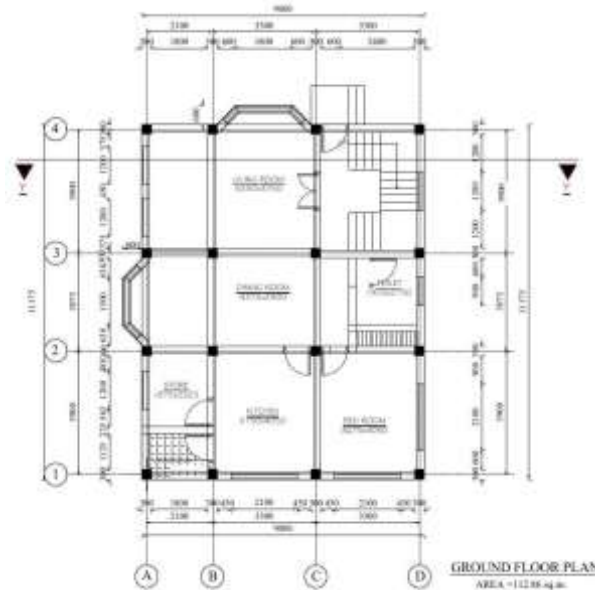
(a). Ground-floor plan (9.0×11.175 m, area ≈ 100.6 m²).
